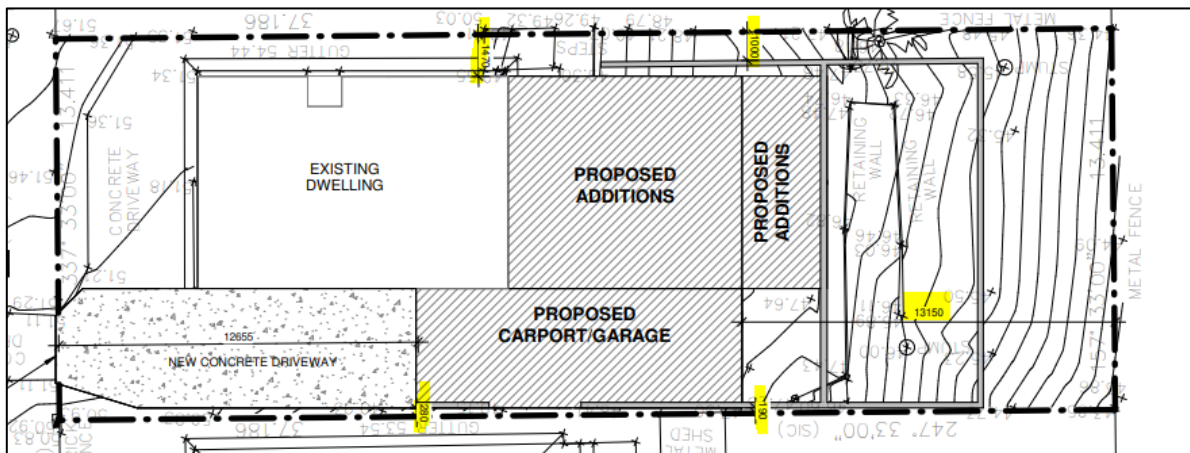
Site plan showing proposed setbacks highlighted in yellow.
